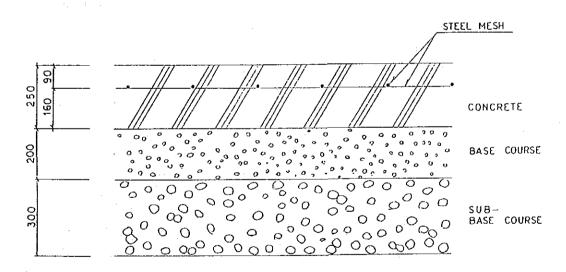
Pavement of Container Yard around CFS Sheds
